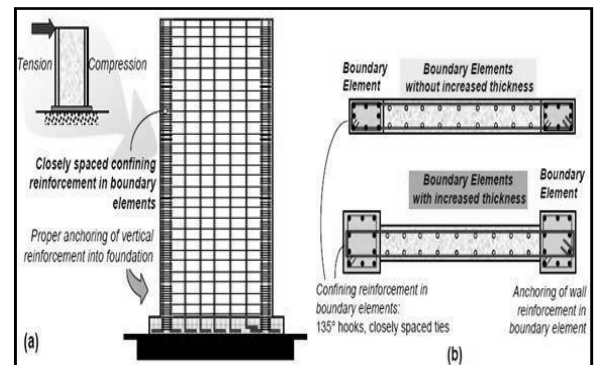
Layout of Main Reinforcement in Shear Wall as per IS: 13920:1993 (IITK: Earthquake Tips)
